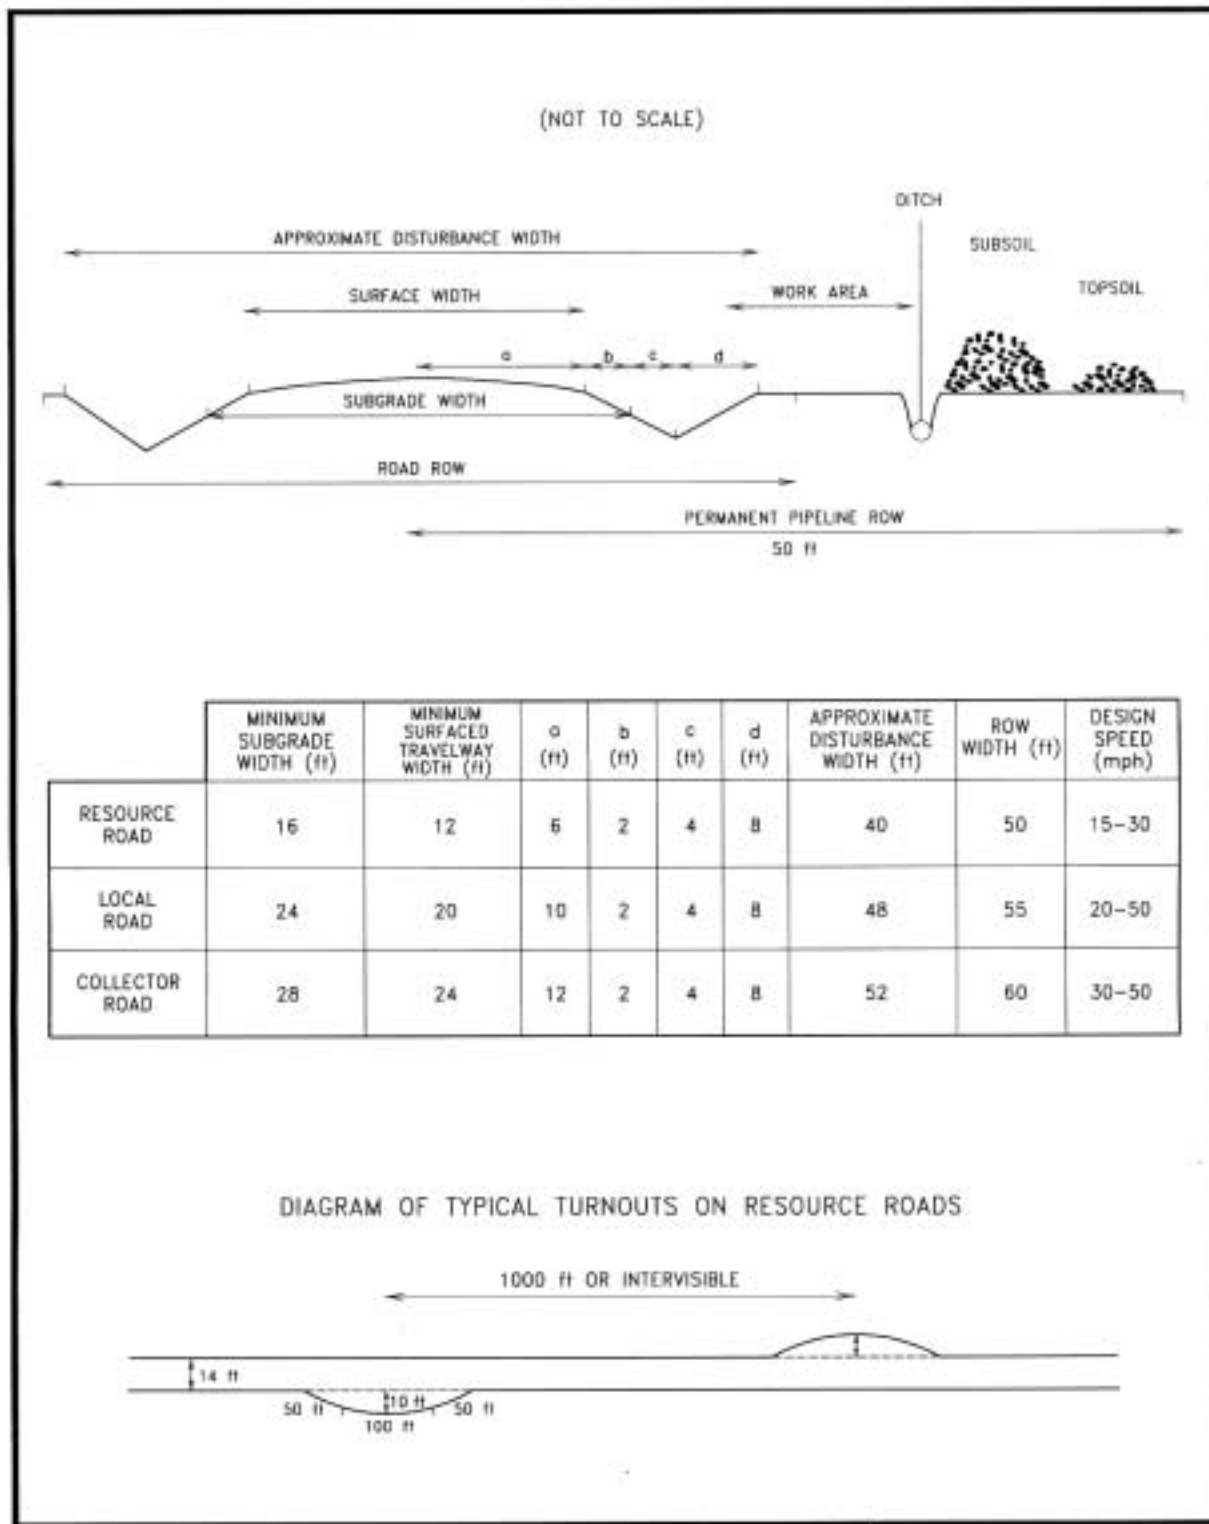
Typical Access Road (Local/Collector and Resource) with Adjacent Pipeline Schematic, Jonah Infill Drilling Program, Sublette County, Wyoming, 2004.
